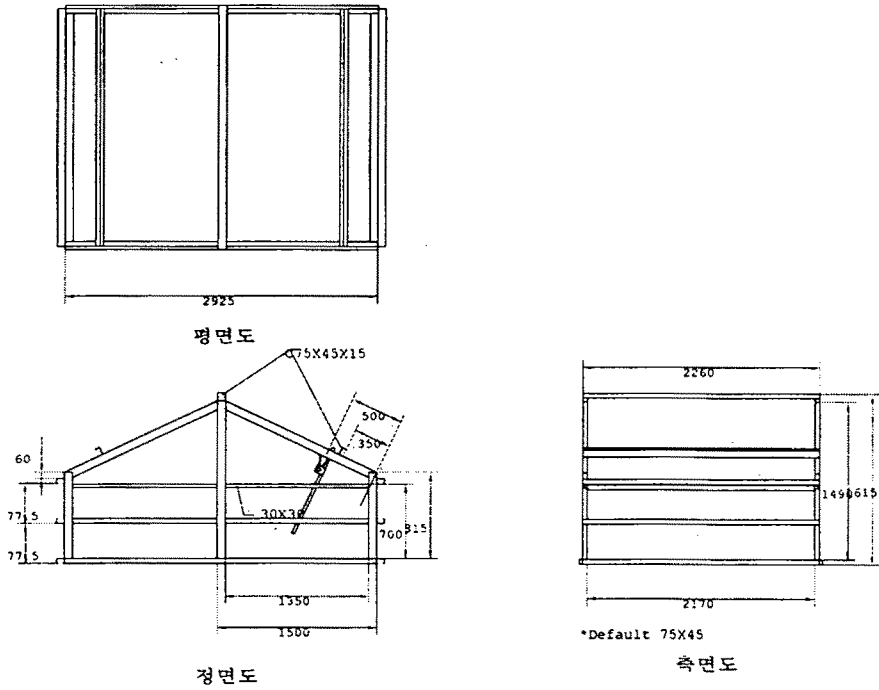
Steel setting drawing with dimension for glasshouse model
